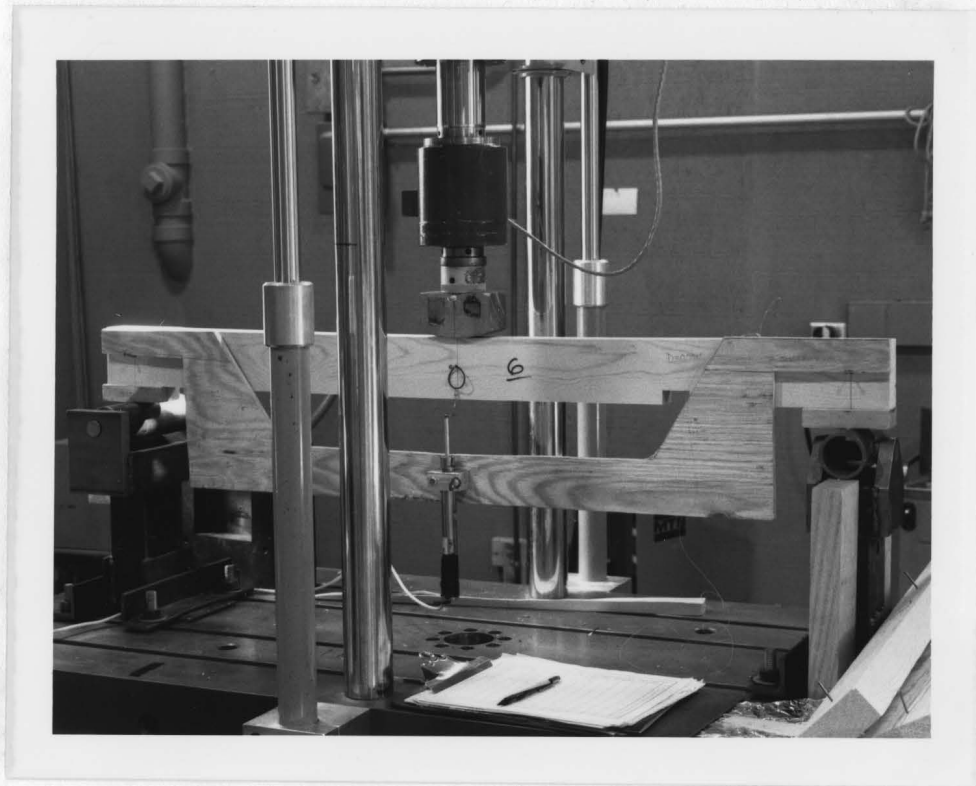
Test rig for bending tests using servohydraulic universal testing machine. Close-up view of workpiece, load head, supports, and deflection yoke.
